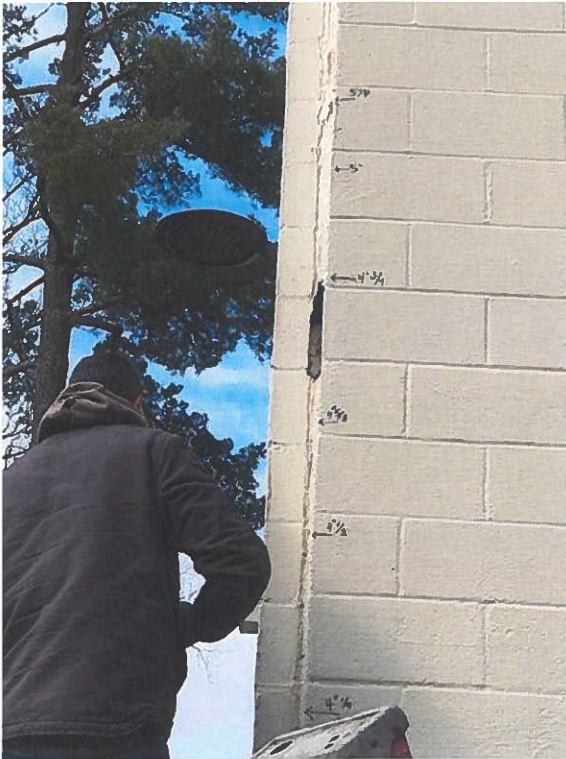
Spalled masonry at corner of Auditorium wall along expansion joint
